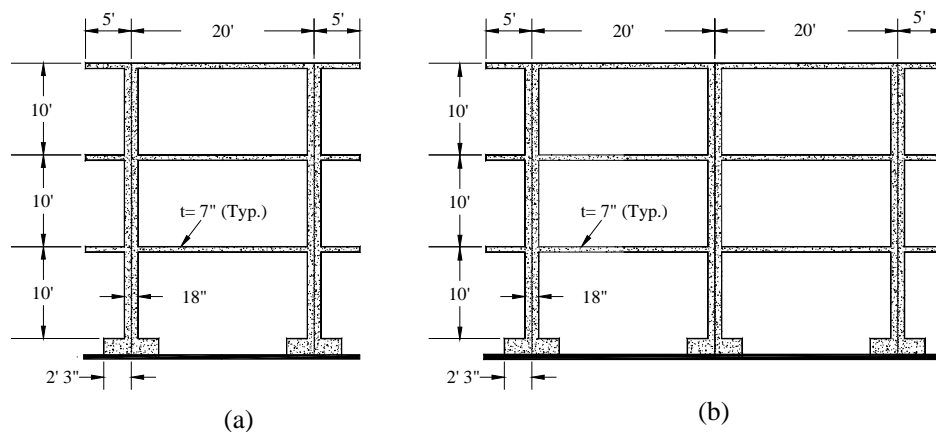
Elevation of the building: (a) north elevation; (b) east elevation.
